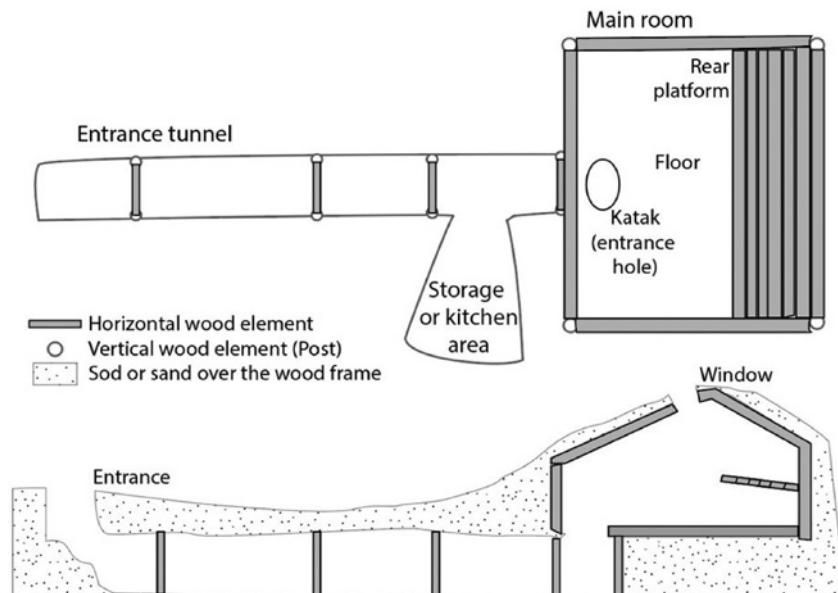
Idealized floorplan and general shape of an Iñupiaq semi-subterranean house (modified from Murdoch 1982: 72)
